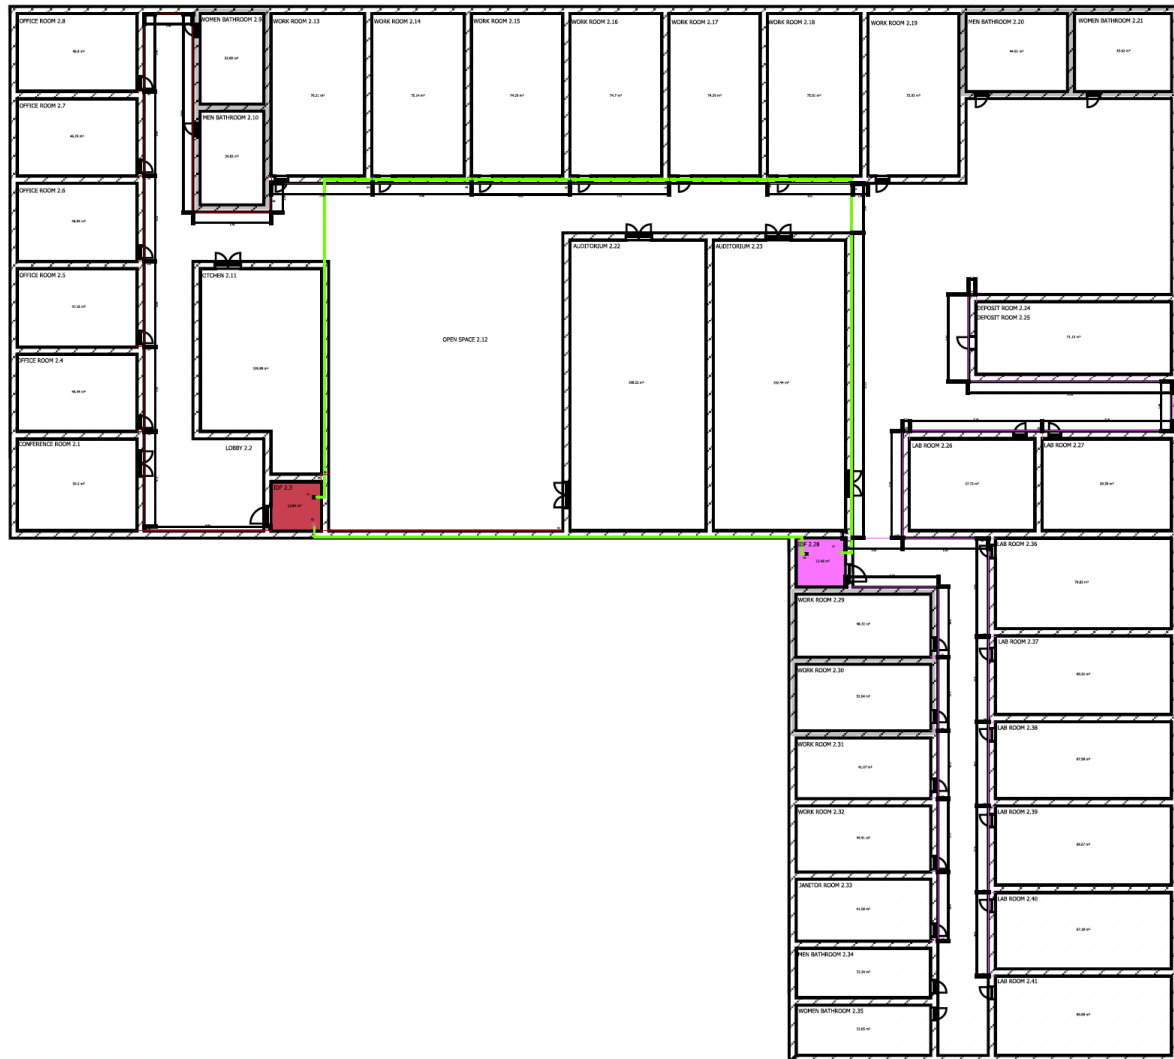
First floor plan showing room layout, IDF2 and IDF3 locations, and main cable tray paths.
